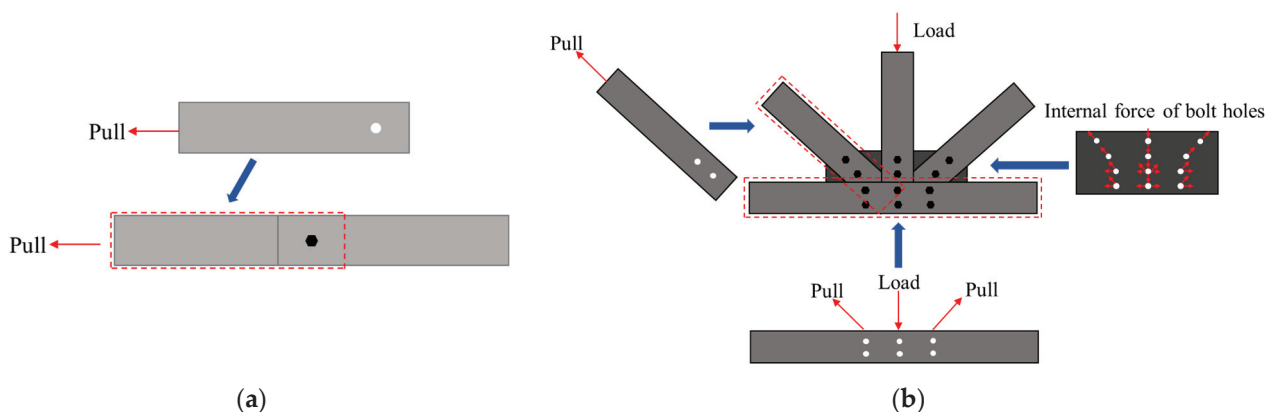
Failure modes of GFRP truss joints: (a) double-lap shear test, and (b) full-scale GFRP joint test.
